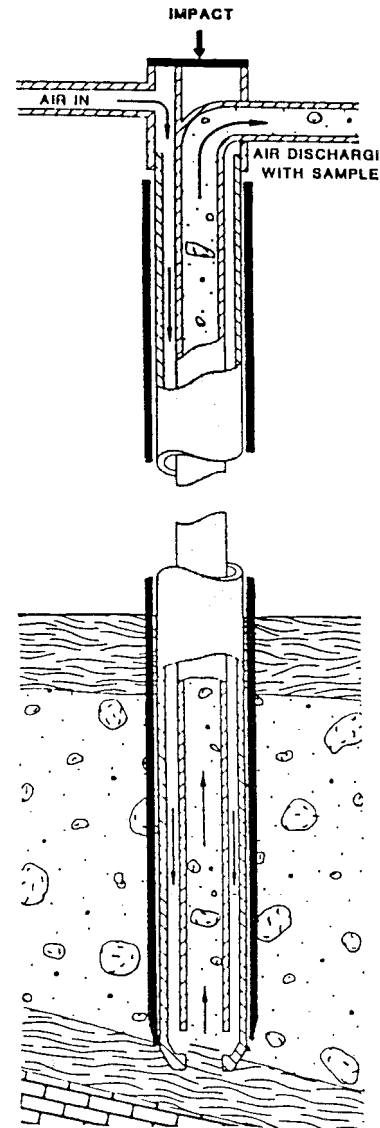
Drilling with the “Triple Wall” Percussion Hammer Method
